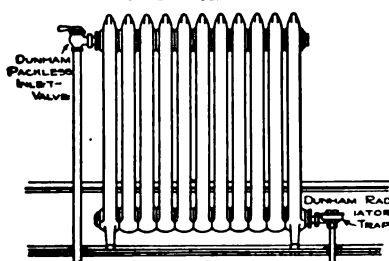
TOP SUPPLY CONNECTION TO RADIATOR
